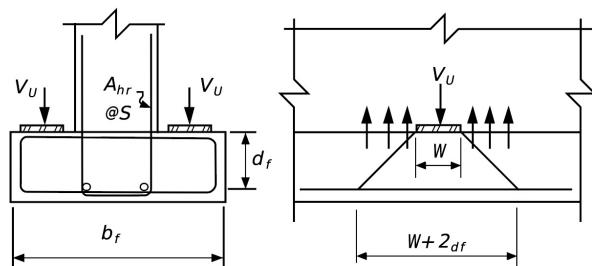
Inverted T-Beam Hanger Reinforcement
